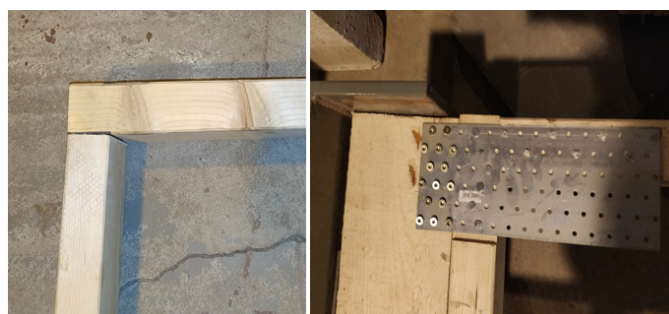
Element with screwed connection after the study (view of cap and foundation connection)
